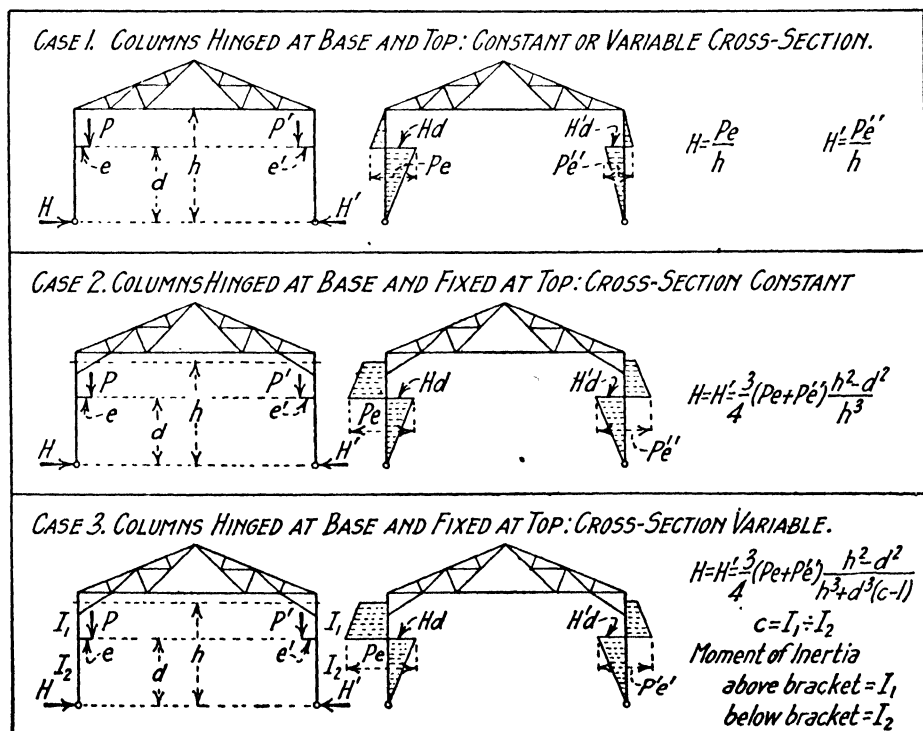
STRESSES IN MILL BUILDING COLUMNS CARRYING CRANE LOADS.
